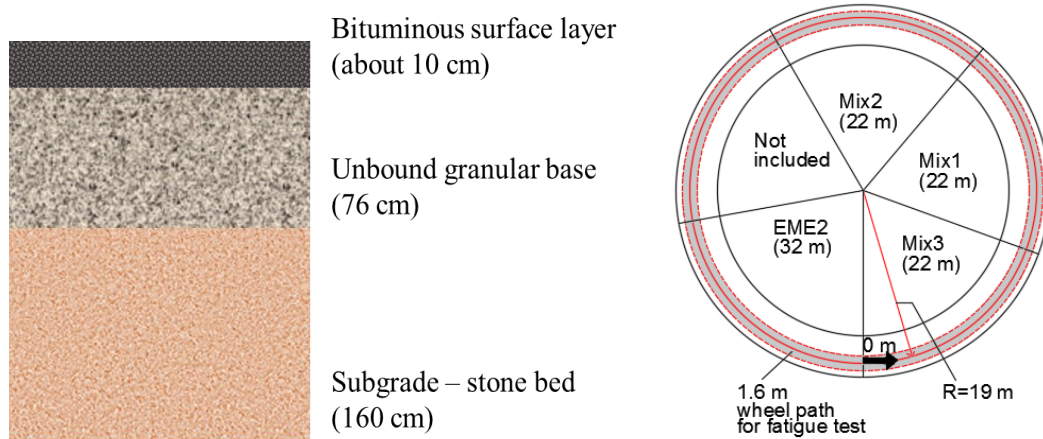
Sections on the APT. (Left) Pavement structure; (Right) layout of the test site.
